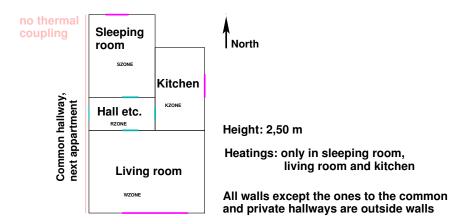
Structure of the residential units, both continuous usage and weekend use scenario. There is no heat exchange via floor, ceiling, and adiabatic walls to next flat on same floor.
